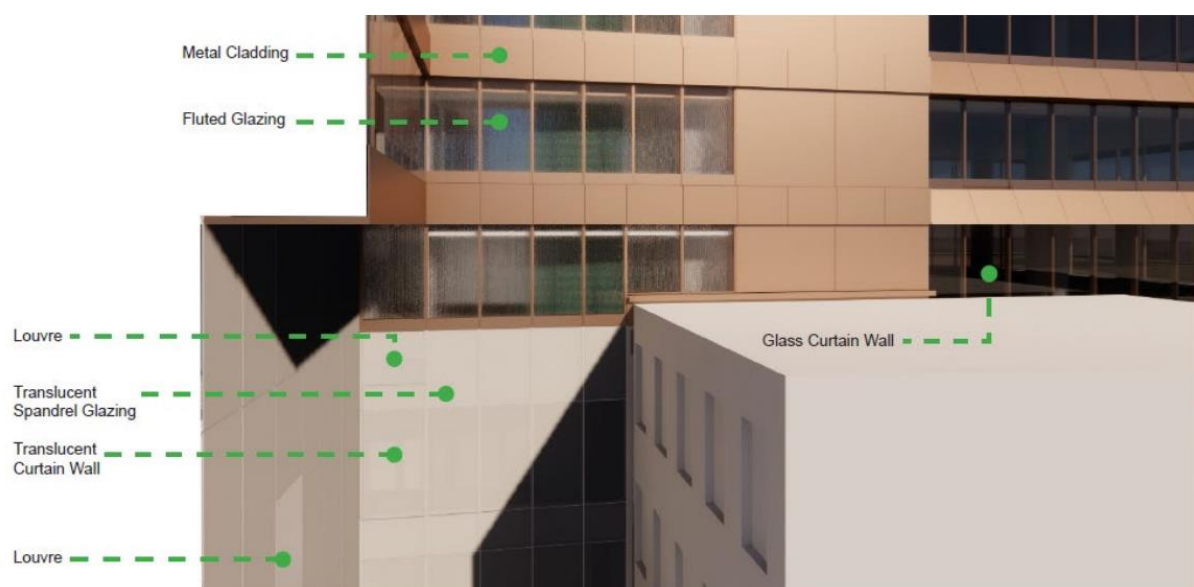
| CGI of proposed changes to the northern elevation (Source: Modification Report)
